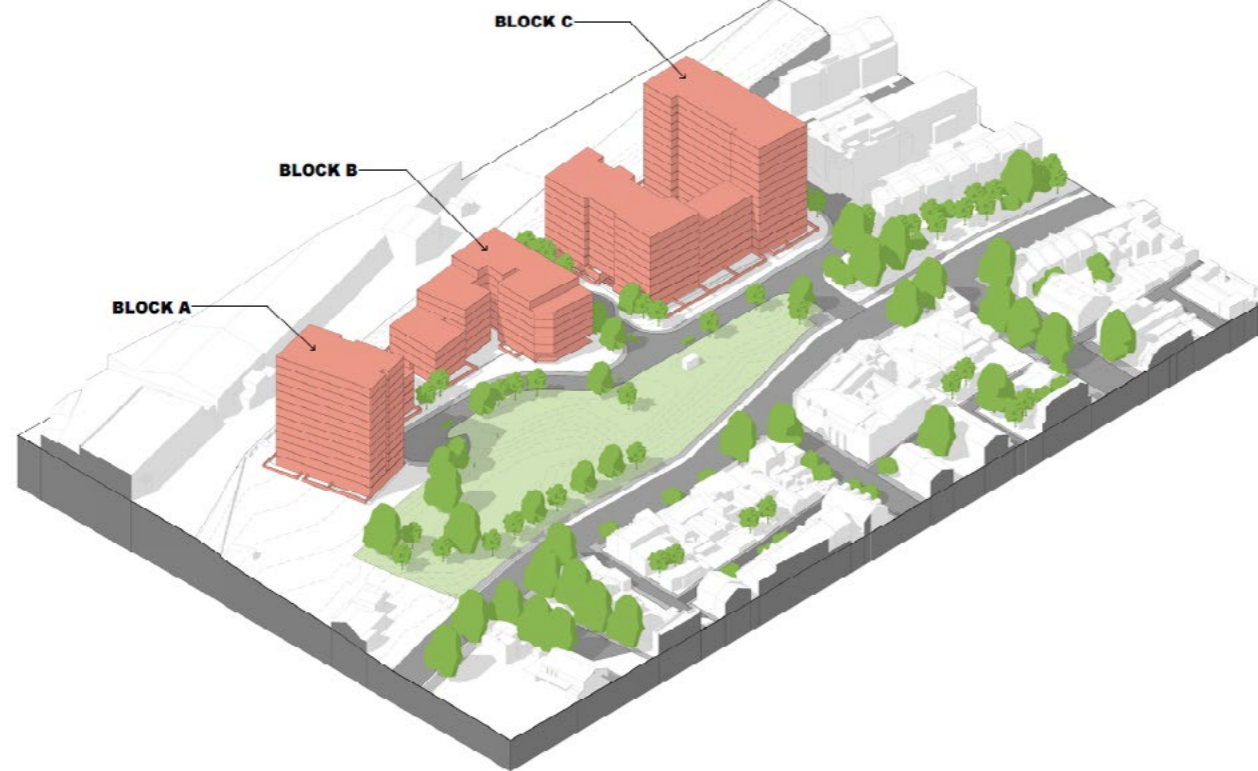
Site plan 3D (Source: Design report workshop 2 WMK)
